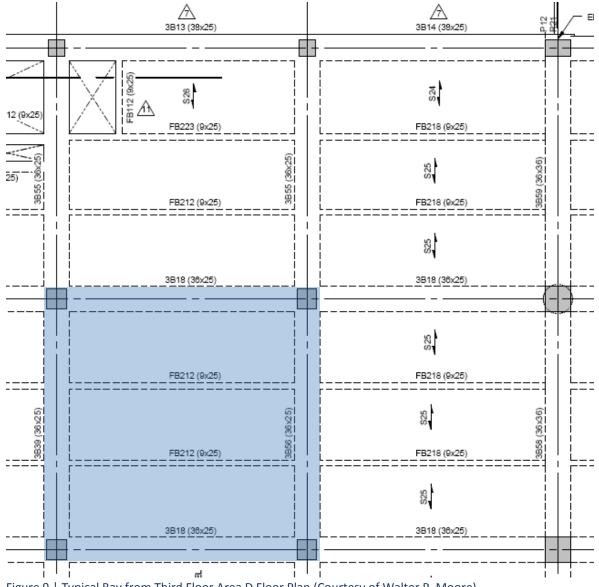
| Typical Bay from Third Floor Area D Floor Plan (Courtesy of Walter P. Moore)
